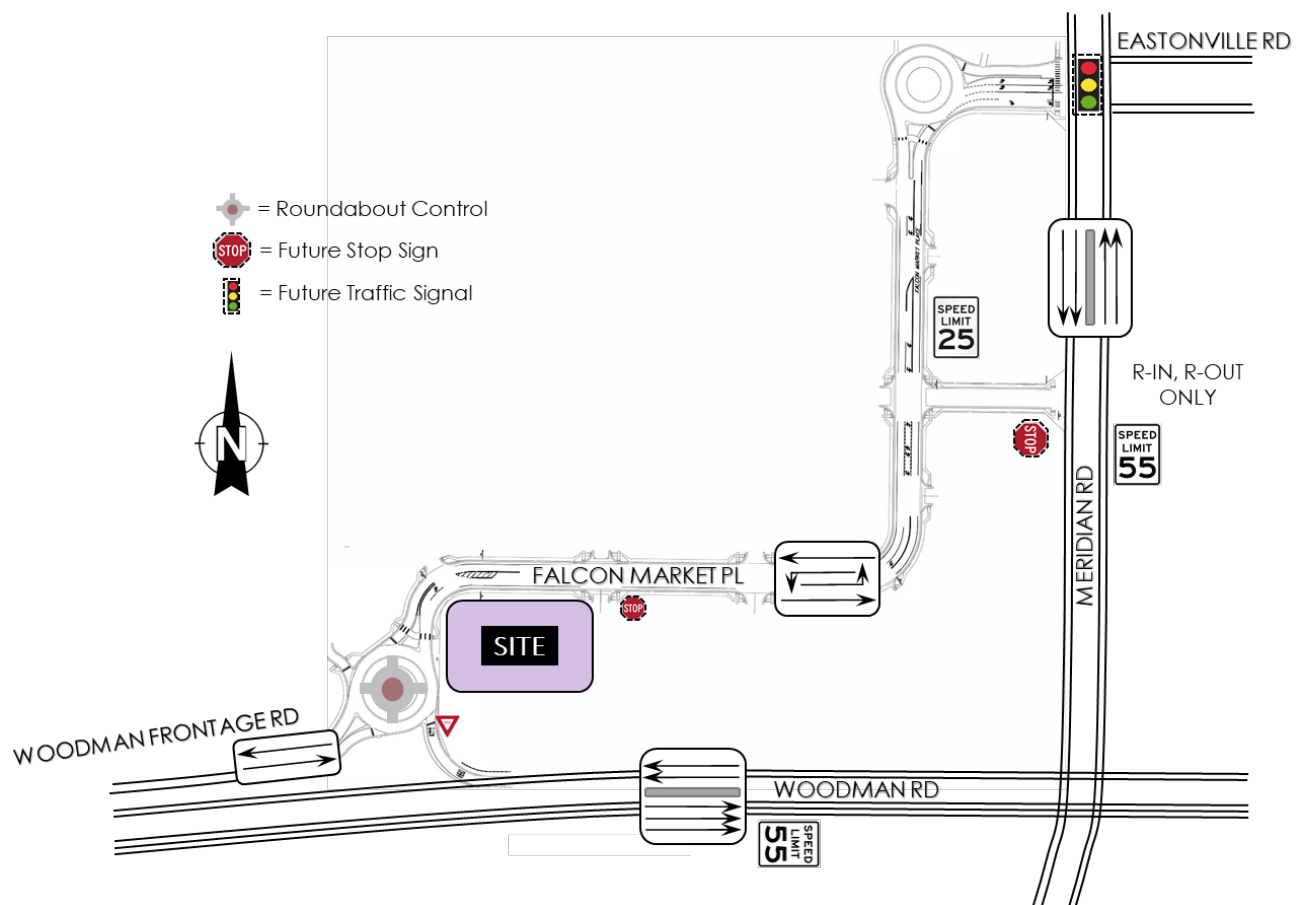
Existing Roadway Network and Intersection Lane Configuration
